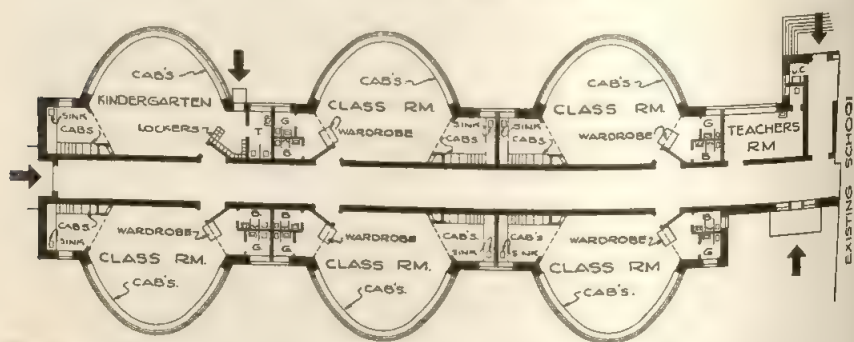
A wing of six parabolic classrooms, as found in the Overlook Hills Elementary School, Abington, Pa. Courtesy of American School Board Journal and Henry F. Daum.
